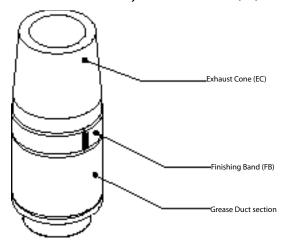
Finished Assembly for Exhaust Cone (EC)
